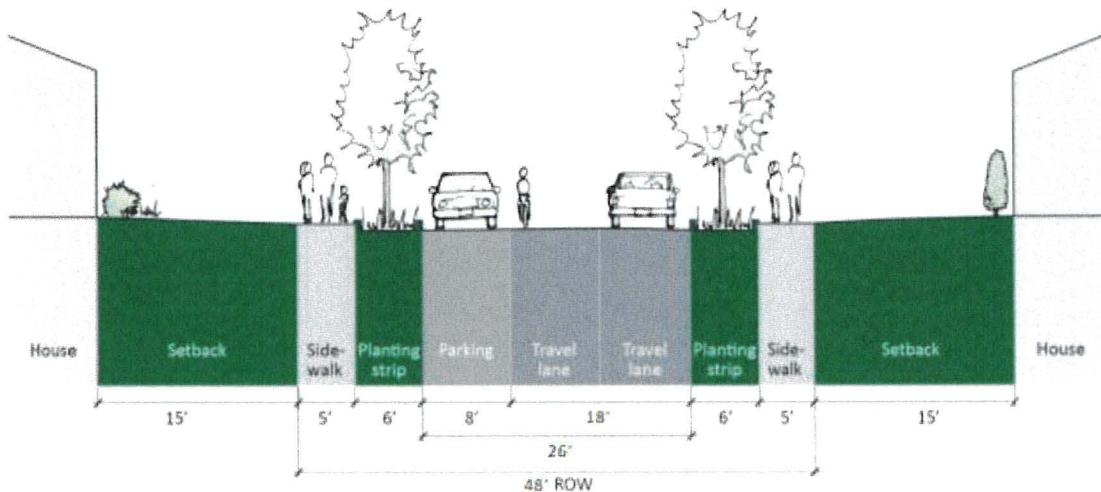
Example of a local access street with integrated parallel parking bulb-outs.
